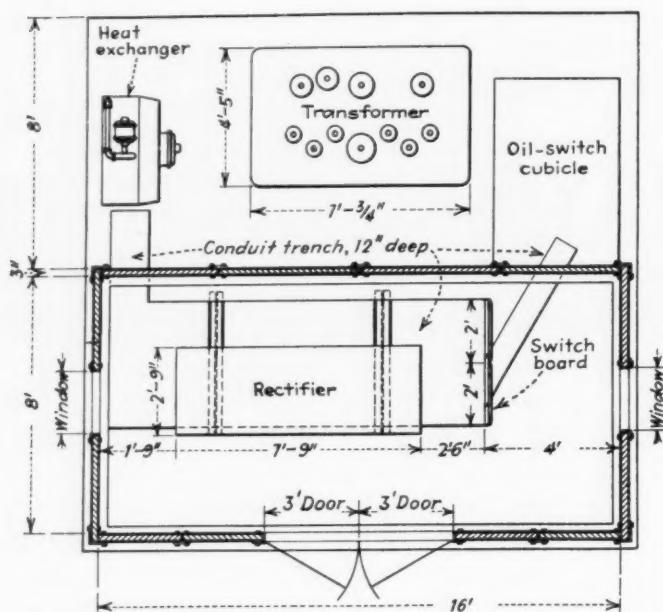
Floor and foundation plan for ignition-rectifier substation
